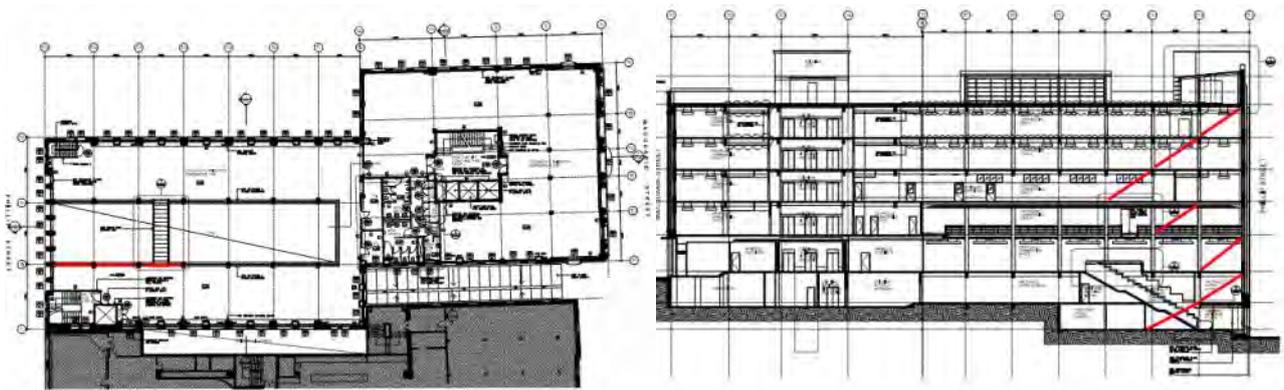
Plan (left) and section (right) showing options for moving bracing along a gridline level to level
